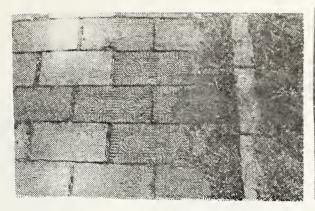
Brick sidewalk and street paving, Ramseur Street near RR and Adrian Street.
